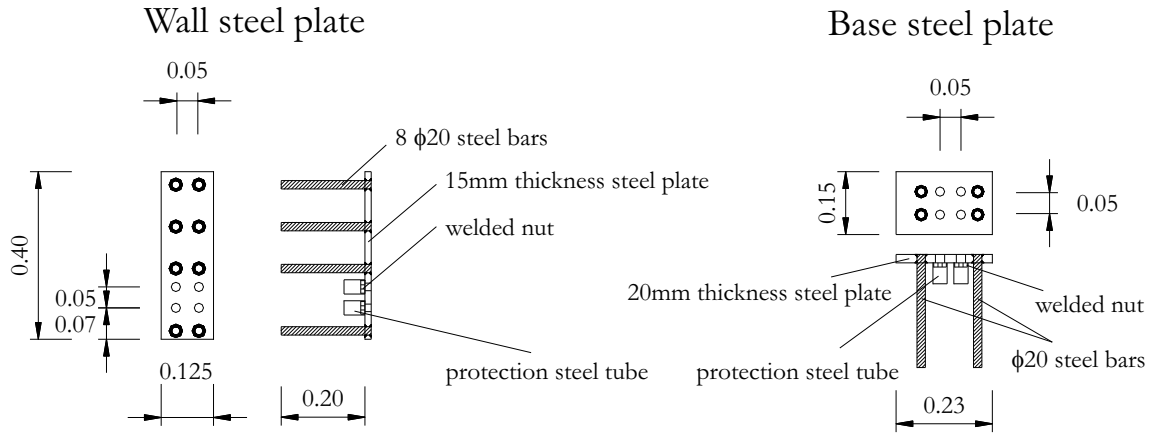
Steel plates details used in specimens RM5 and RM6.
